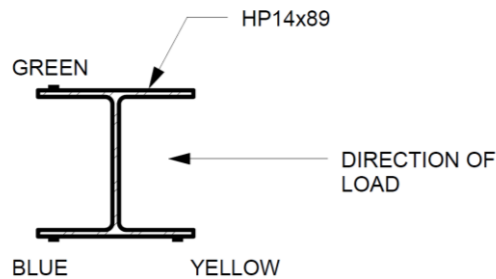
Strain Gage Layout at Typical Instrumented Section
